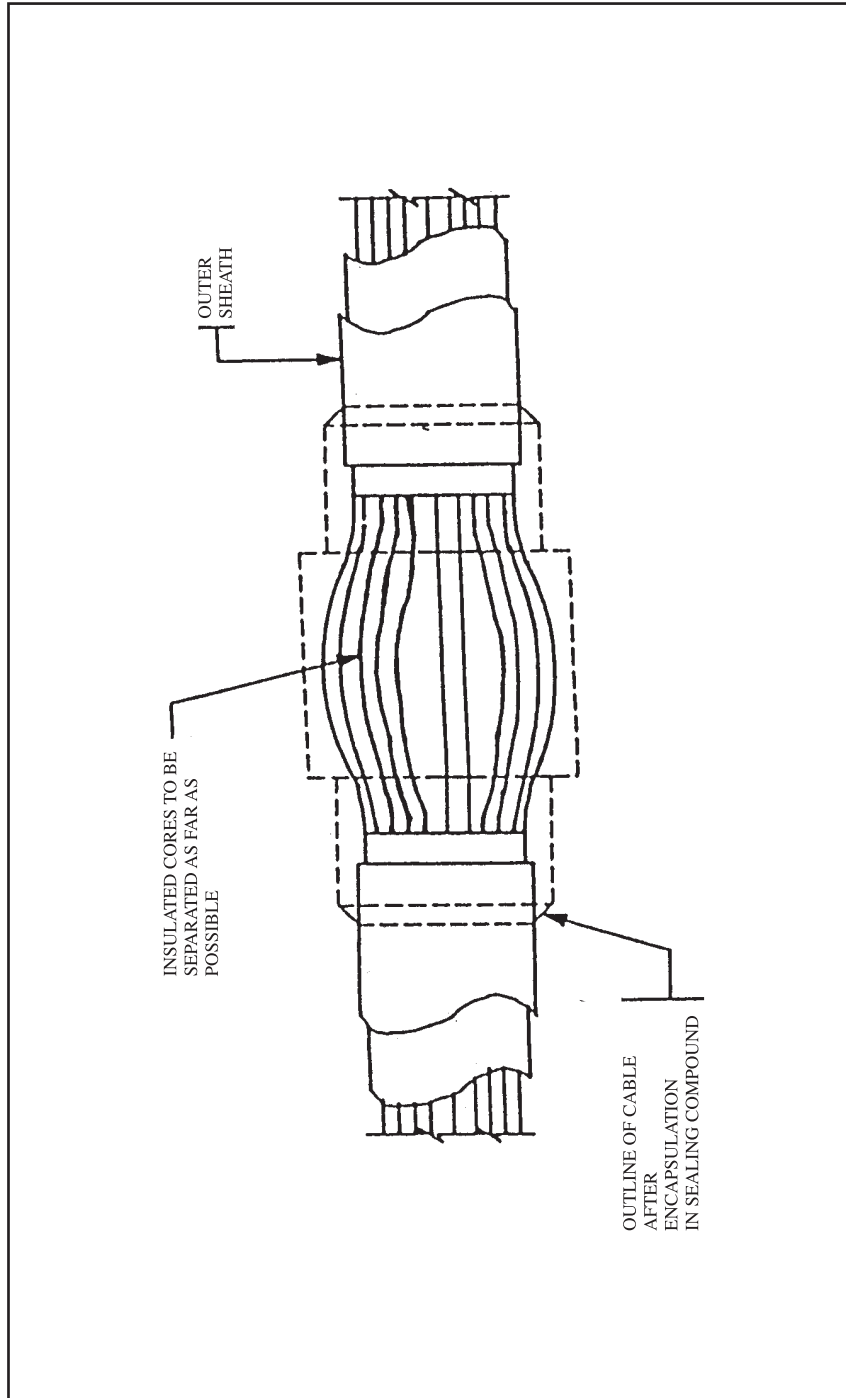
TYPICAL ARRANGEMENT OF CORE SEALING OF MULTI CORE CONTROL CABLES
